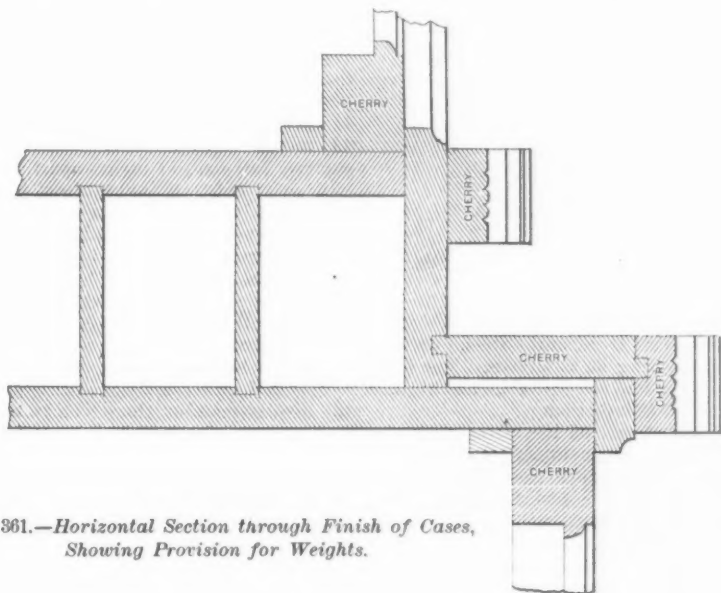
Horizontal Section through Finish of Cases, Showing Provision for Weights.
